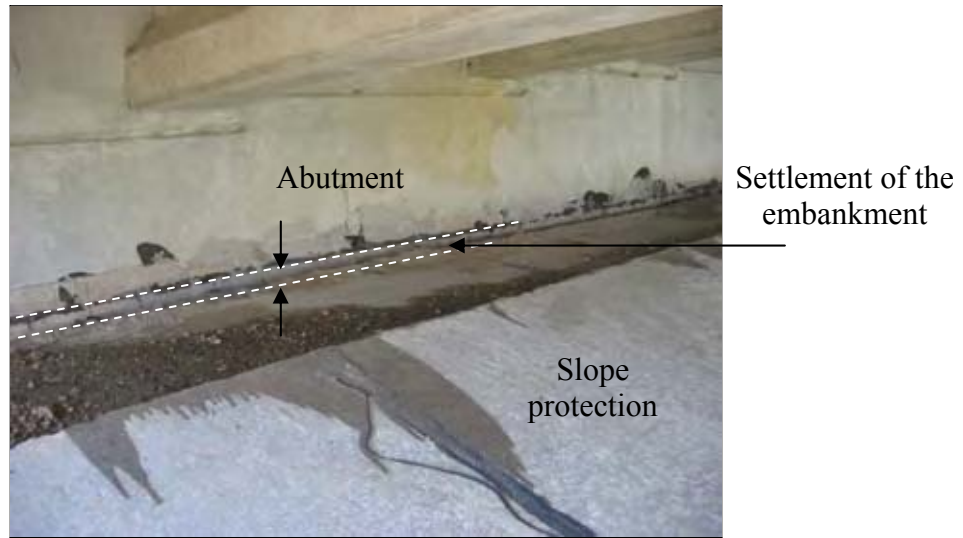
Settlement of the embankment under the bridge and a gap between the embankment and the abutment
